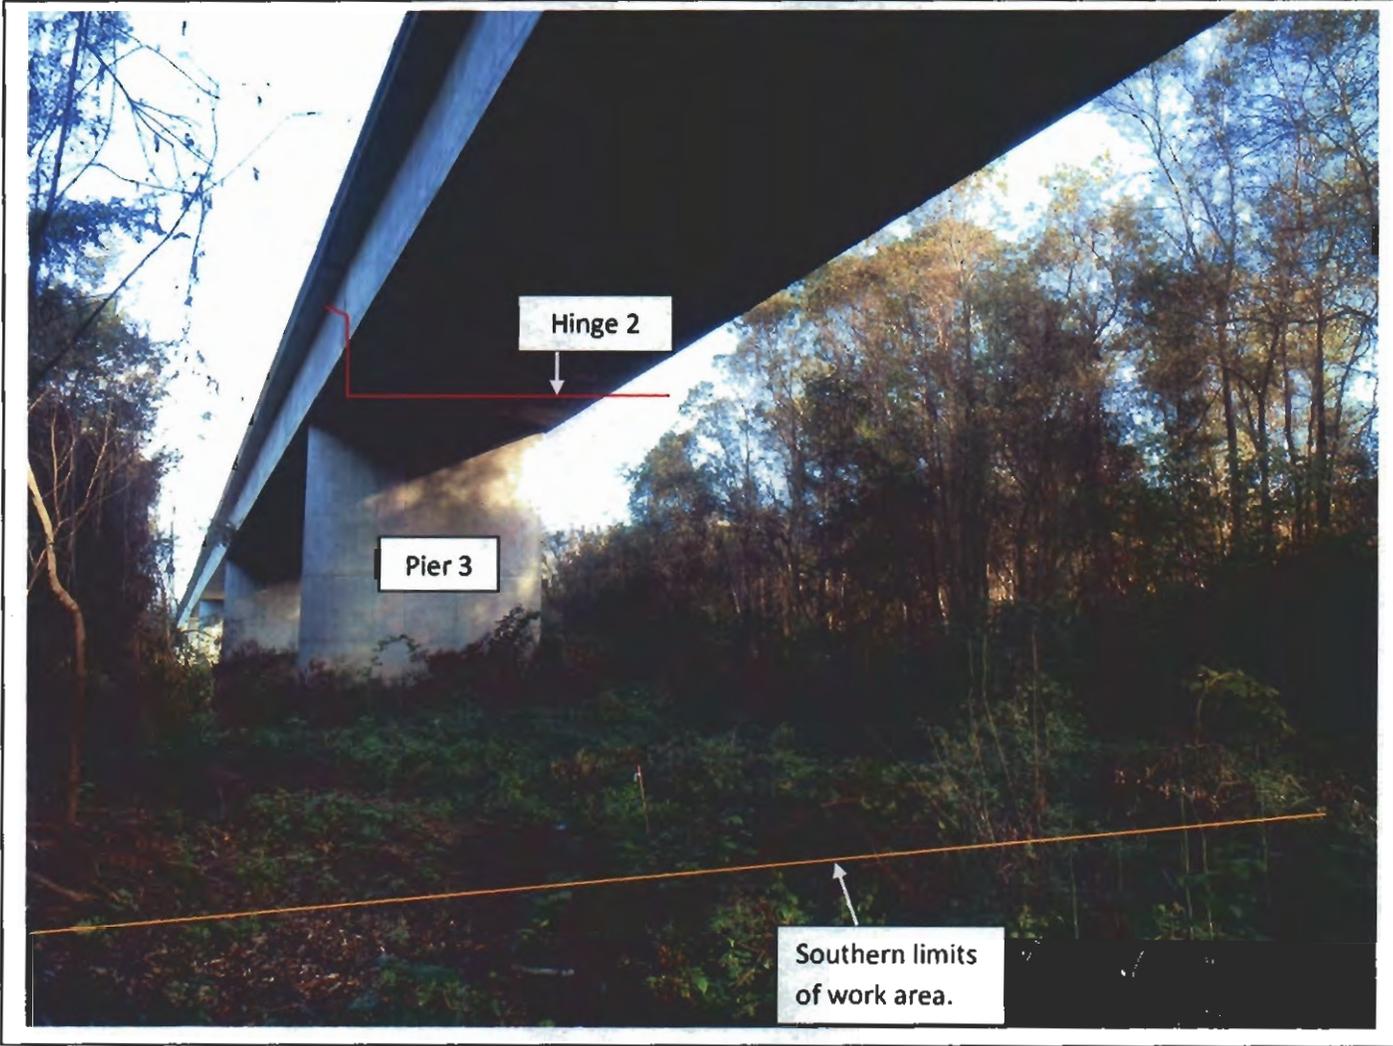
Hinge 2 Work Area: Vegetation Trimming Area (Facing North From Pier 2)
